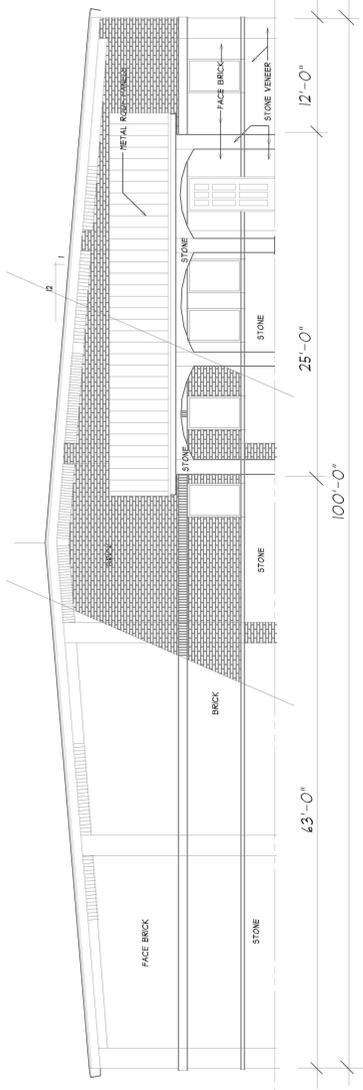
Exhibit A shows the elevations as approved and Exhibit B is a photograph and elevation as it was built.
